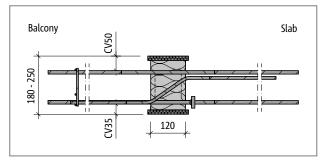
Schöck Isokorb® XT type C-L-CV50: Product section
